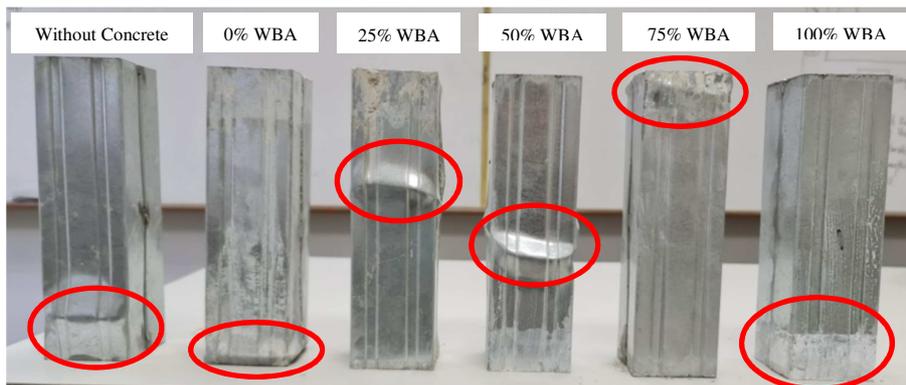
The failure mode of the built-up CFS specimen from the front view
